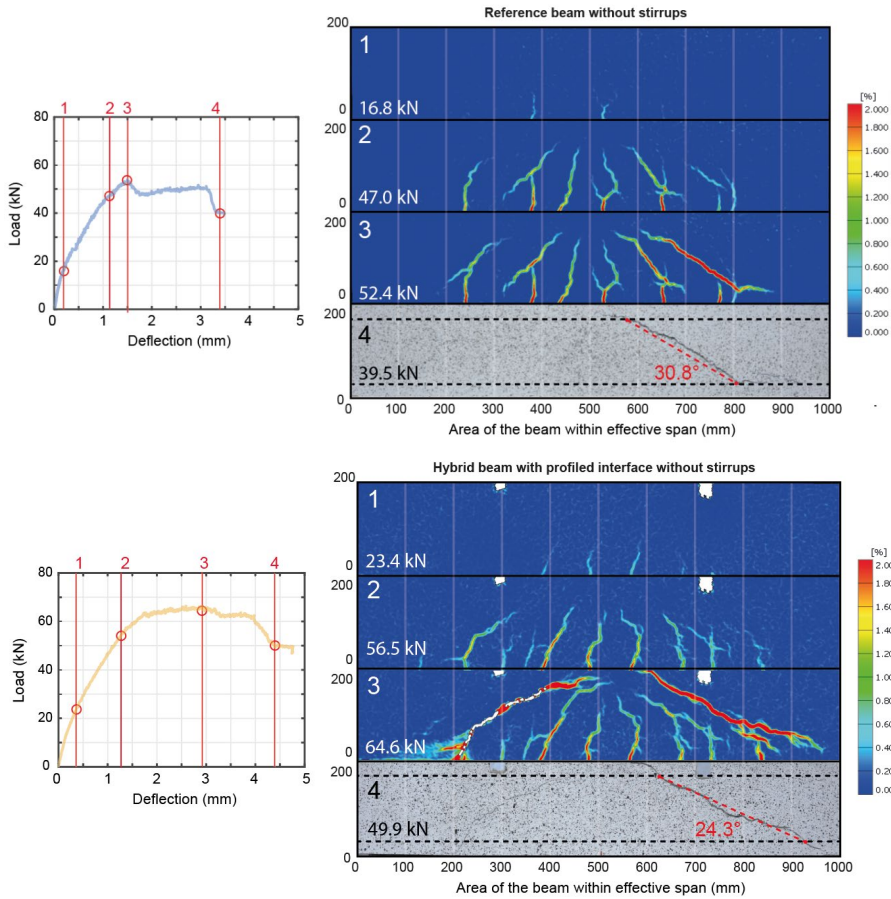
Crack pattern development within the effective span of (a) reference beam without stirrups and (b) hybrid beam without stirrups.
